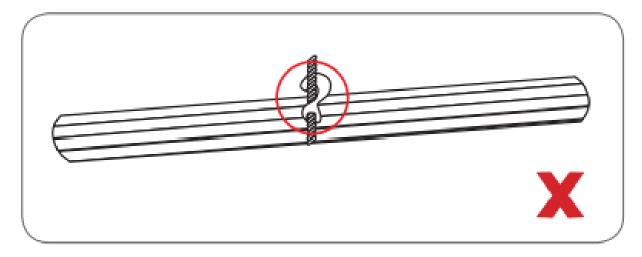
The load will tilt to one side during lifting if it is not rigged correctly.
